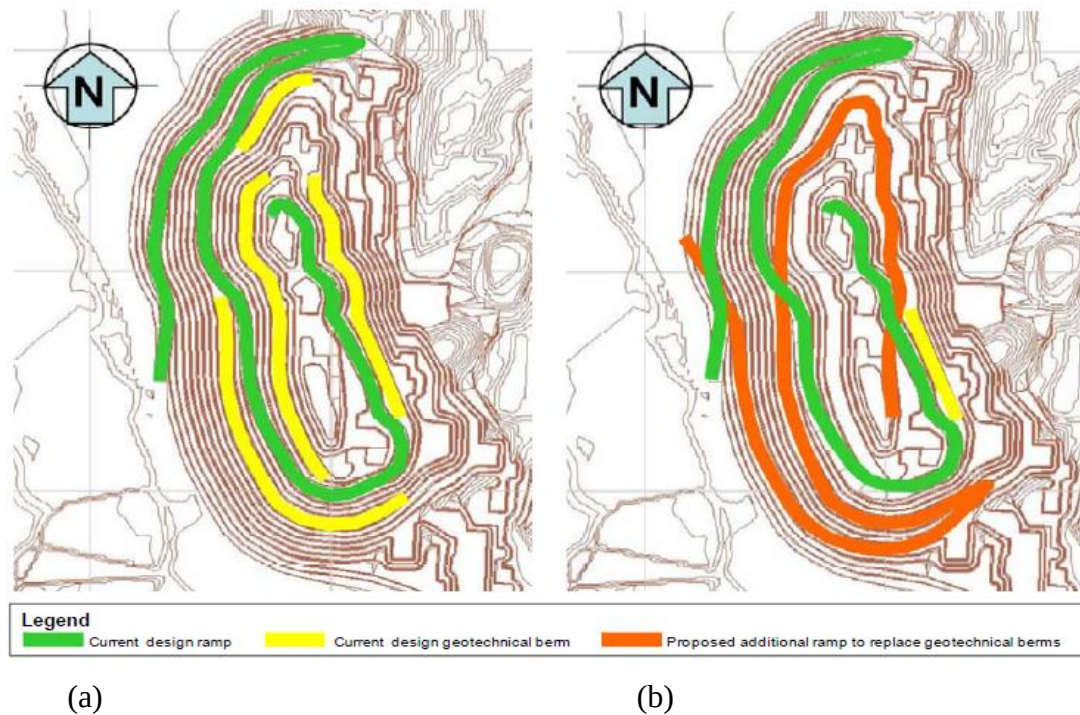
Current (left) and recommended (right) design layouts of ramps and geotechnical berms (SRK, 2009)
